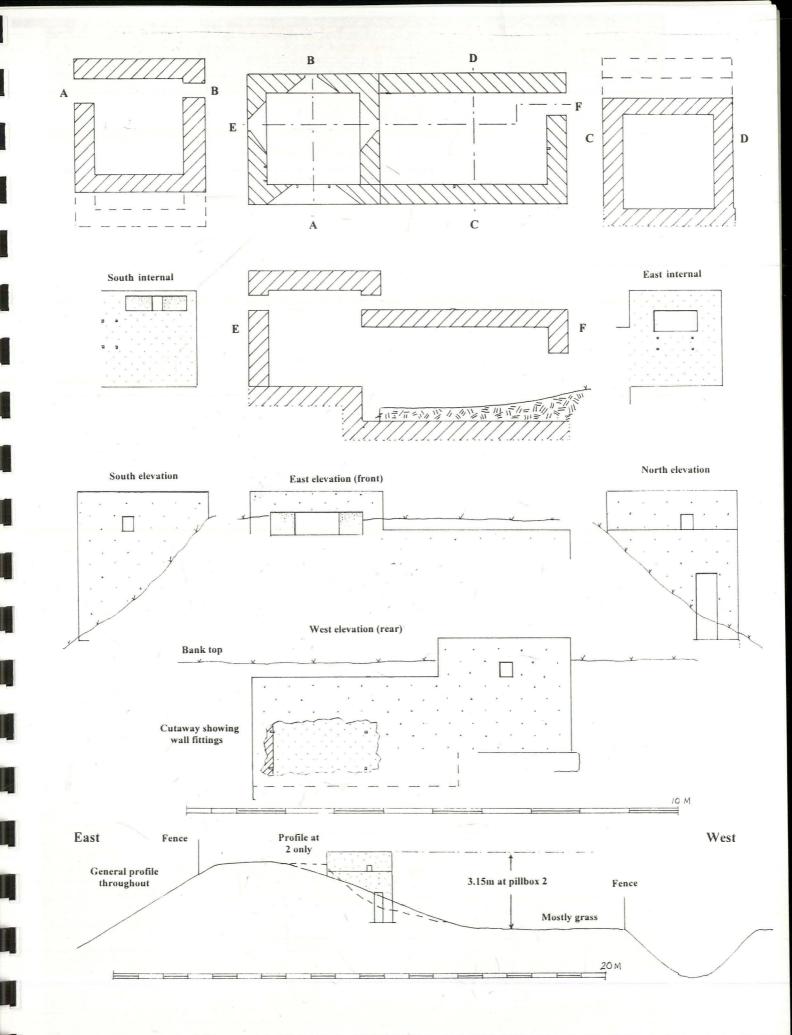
Plan, cross-sections and elevations of pillbox 2 (Clark).
